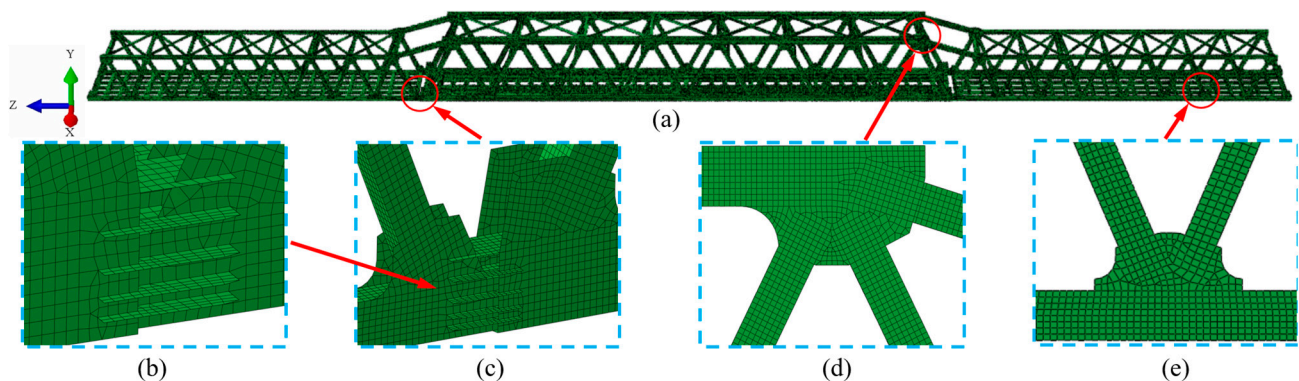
FEA model schematic diagram of steel truss bridge: (a) overall; (b) enlarged view of temporary lower chord; (c) temporary lower chord; (d) upper chord; (e) lower chord.
